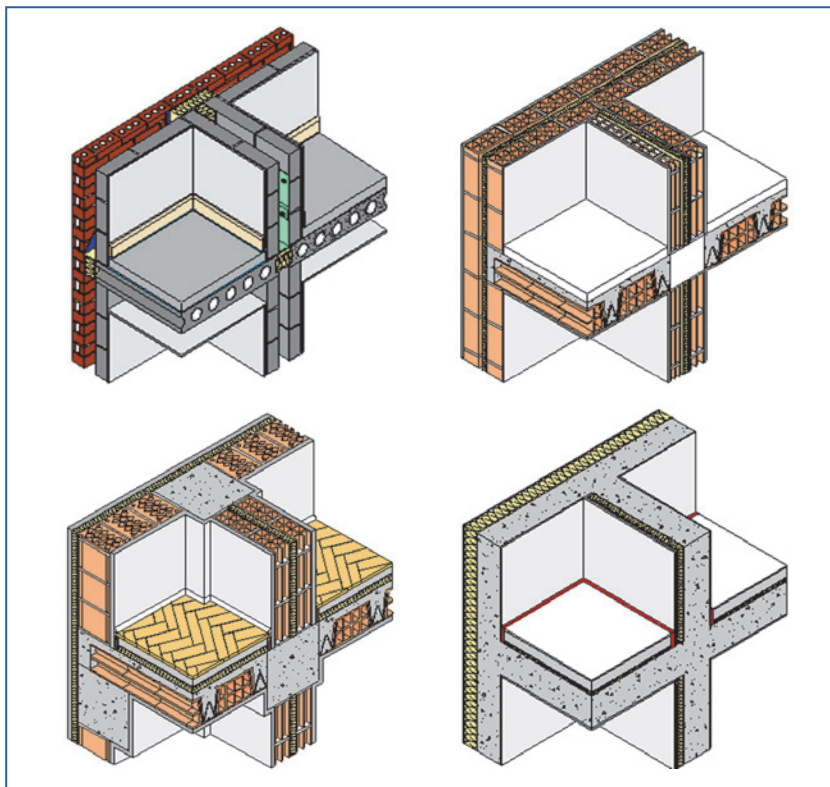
Examples of concrete, blockwork and clay based wall and floor systems built in European countries: Top left – UK; Top Right – Italy; Bottom left – Macedonia; Bottom right – Switzerland. (Wood, TU0901 Florence, 2010).
